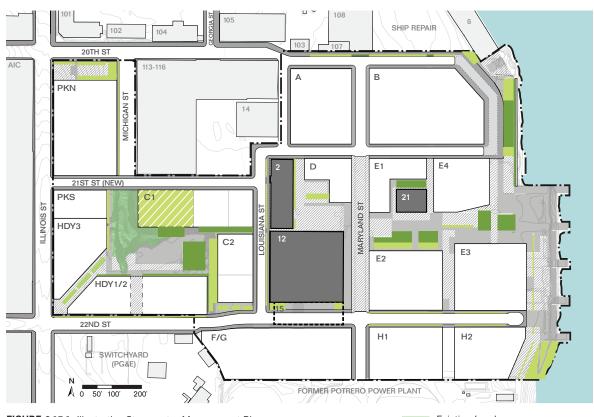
Illustrative Stormwater Management Plan
